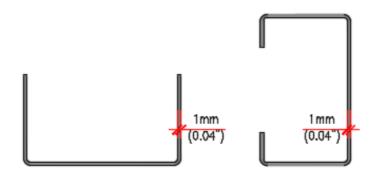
Section type of structure in galvanized steel (Channel) (Galvanized steel DX51D Z+)
